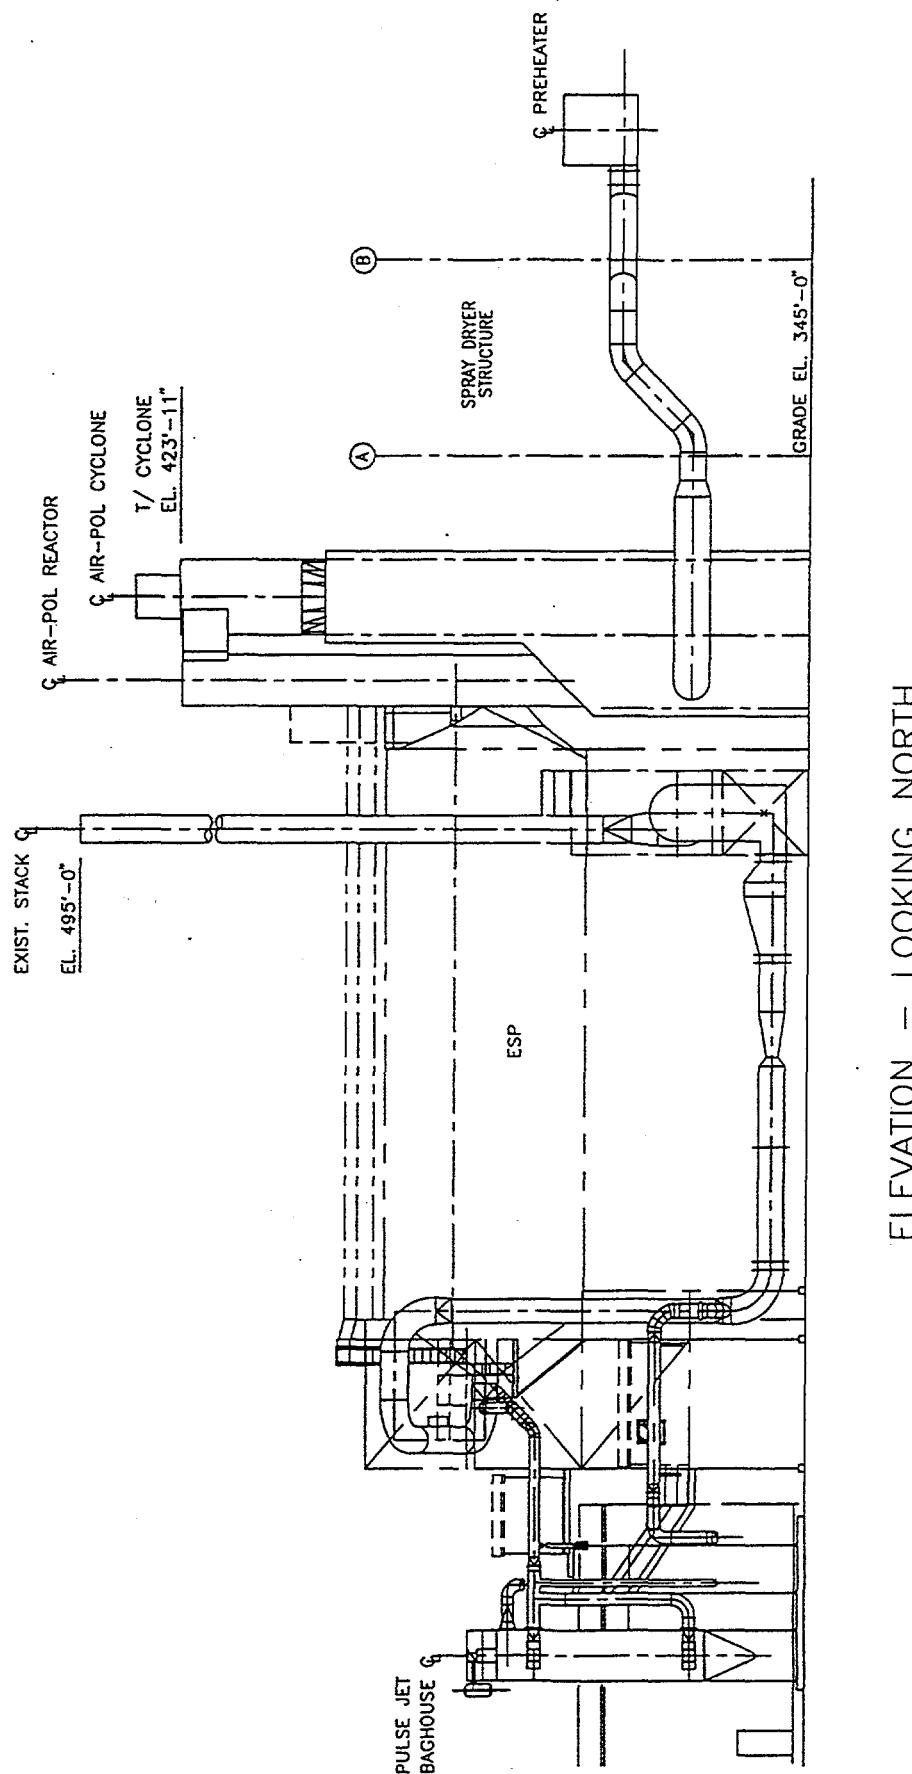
ELEVATION OF GSA EQUIPMENT
